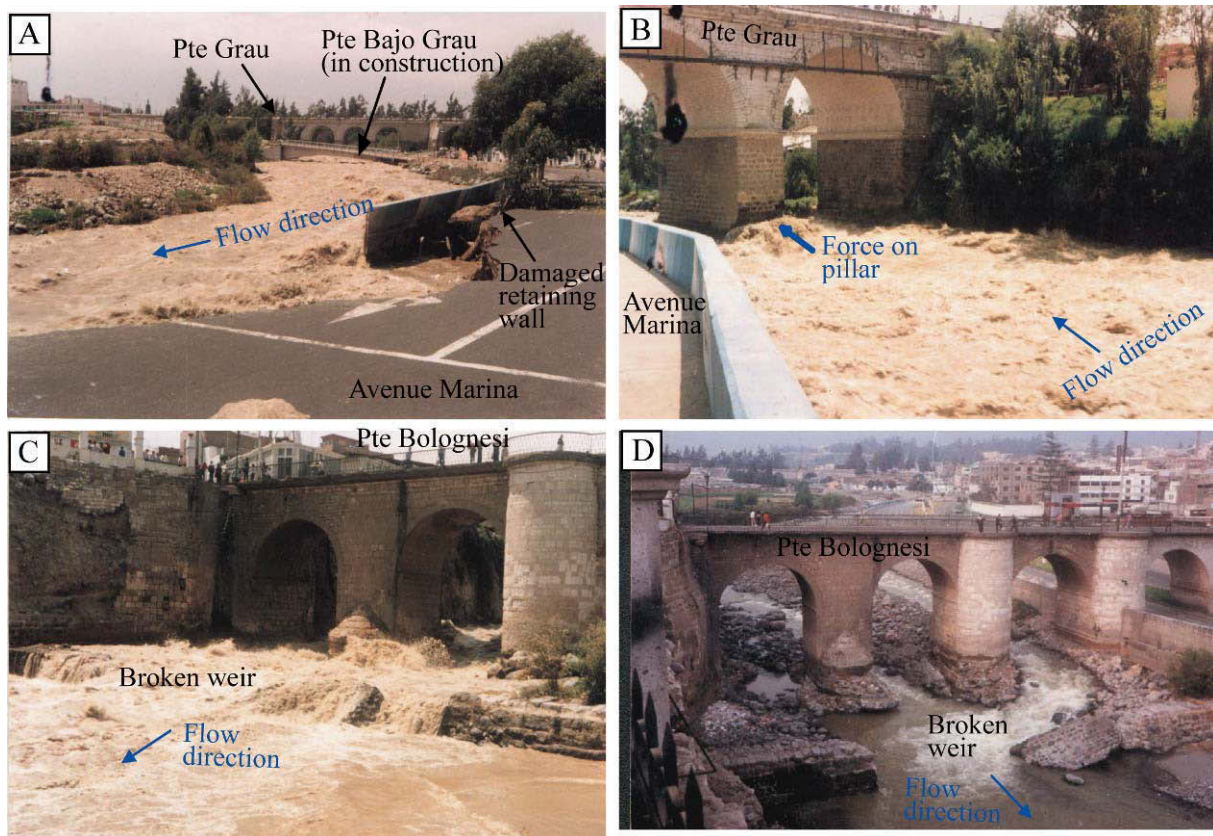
Events and damage caused by the February flood in Arequipa. A: Broken retaining wall of the Rio Chili allowing flood water onto Avenue Marina. B: Upstream of the bridge, note the force of the flow on the pillars. C: Downstream of Puente Bolognesi, the destroyed weir in the flood waters of the Rio Chili. D: The wrecked weir, obvious after flood waters receded. Photographs obtained from Victor Rodriguez.
